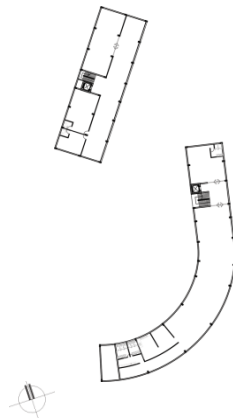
Second Floor Plan of Administrative and residential block (Source: Author)
